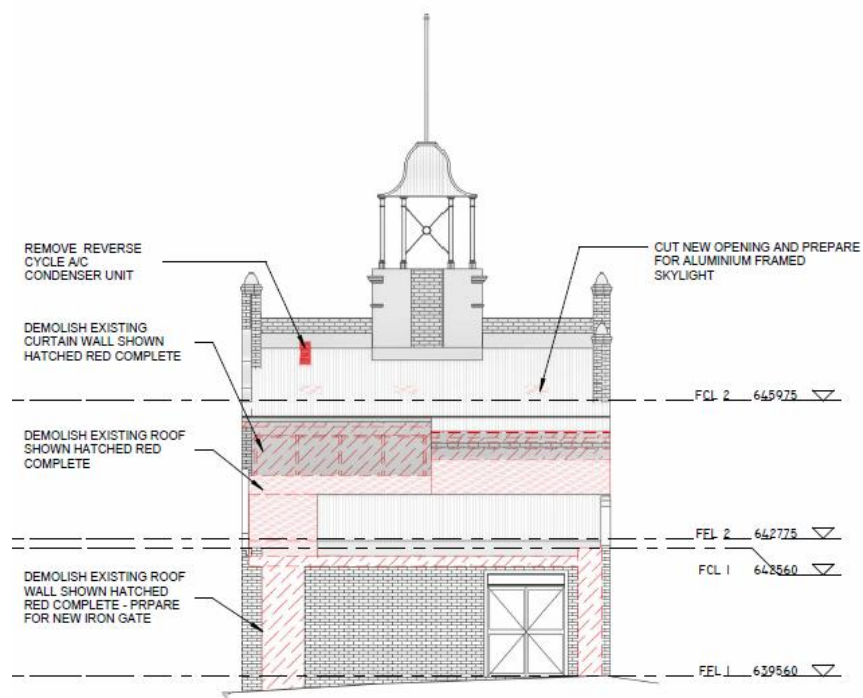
Bergmark street view. Partial demolition of the existing structures to the rear of the site is shown hatched in red (Source: TLA)
